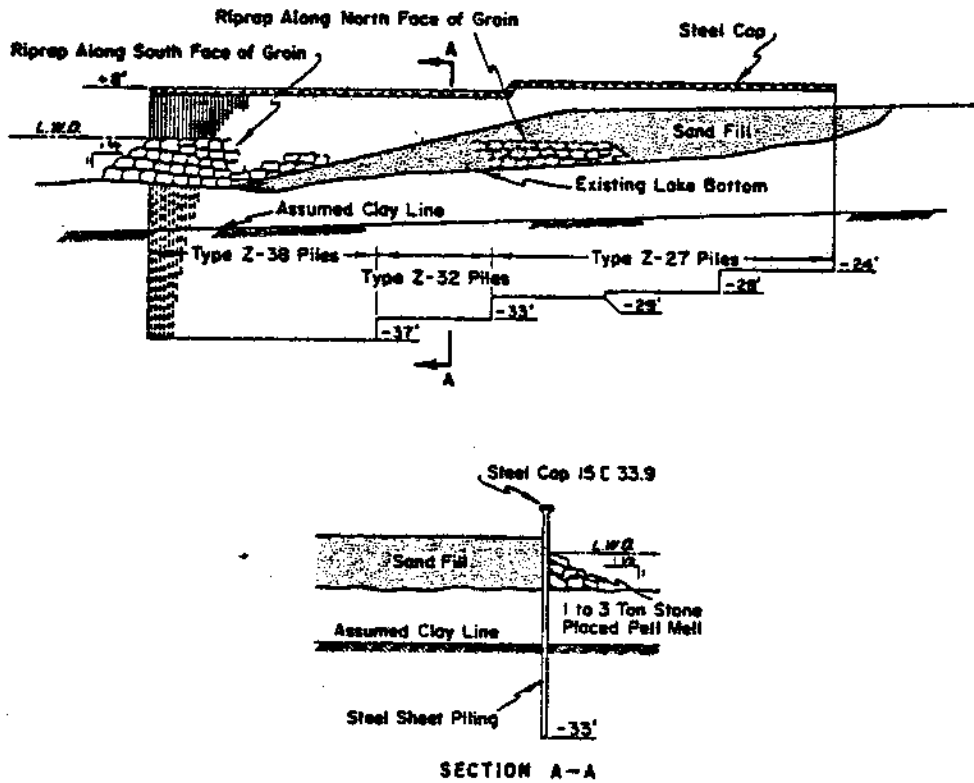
Cantilever Steel Sheet Pile Groin (CERC, 1977, p. 6-79)
